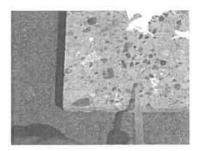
Place a drop of clean drinking or distilled water on the pavement surface.
